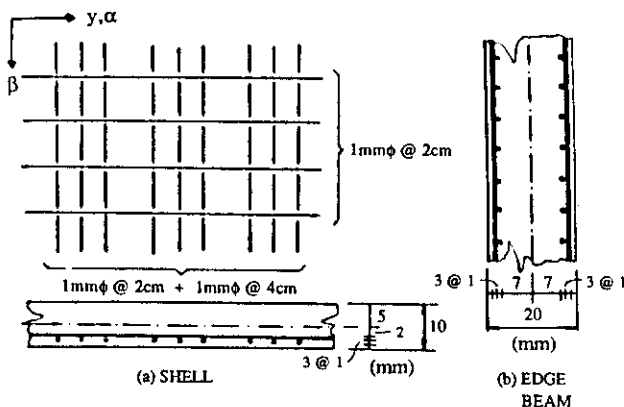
Ex. 2. Reinforcement for Shell and Edge Beams.
